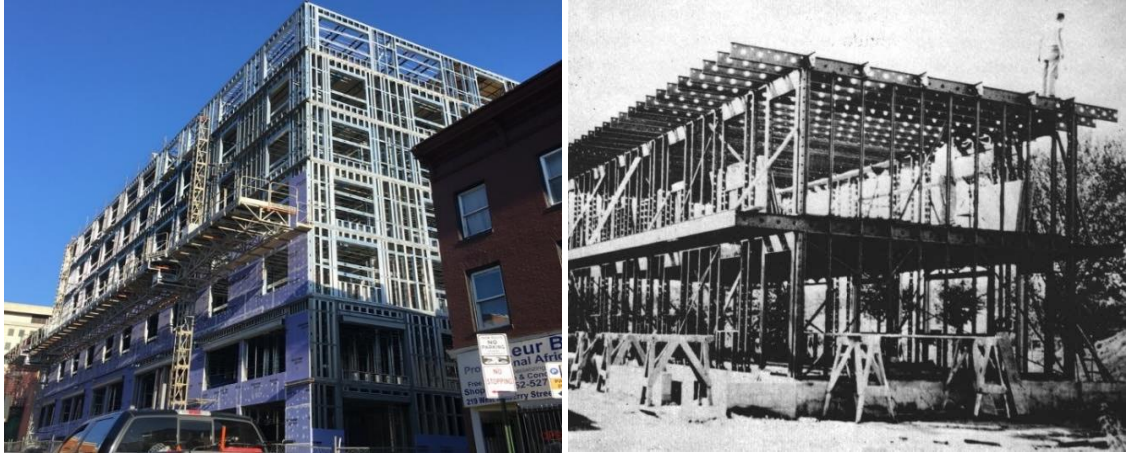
1 Application of cold-formed steel members: (a) current cold-formed steel buildings; (b) first metal building with only cold-formed steel as major structural members (Yu, 2000)
